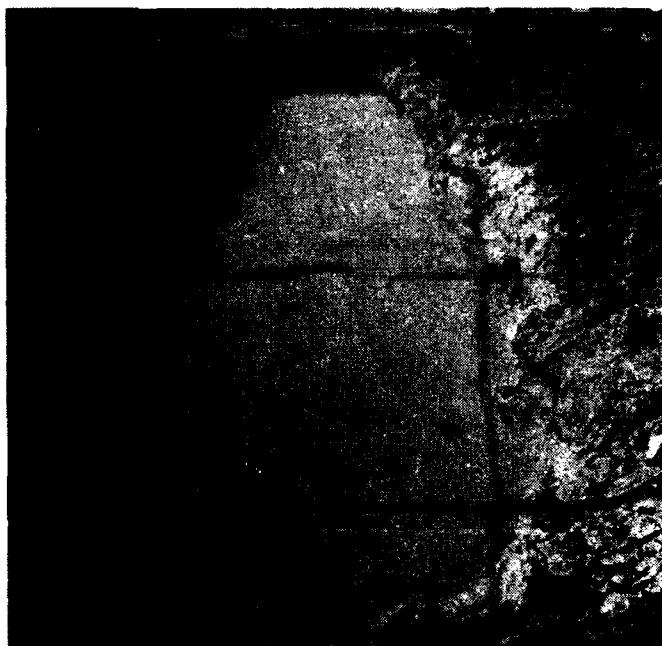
Cofferdike - slurry trench excavation (October 1977)
